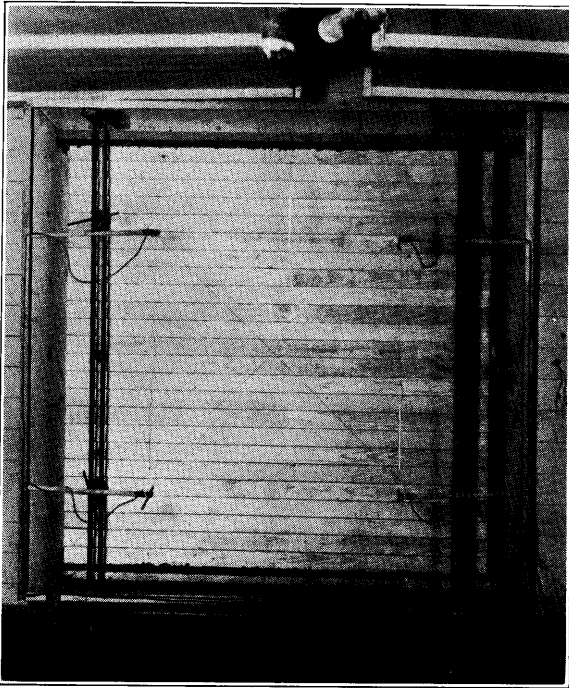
WALL SECTION IN PLACE FOR TEST
